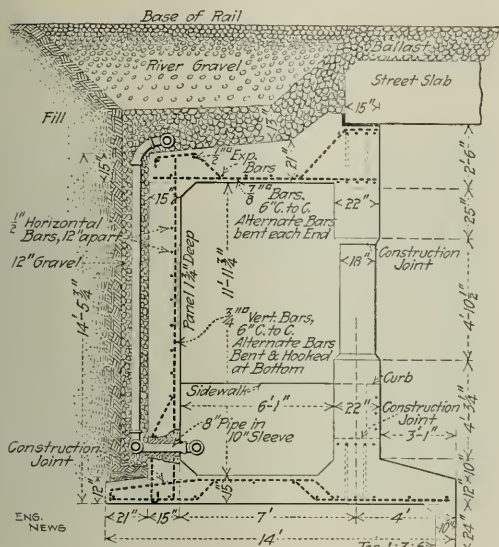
SECTION OF BOX ABUTMENT, WITH DRAINAGE SYSTEM
